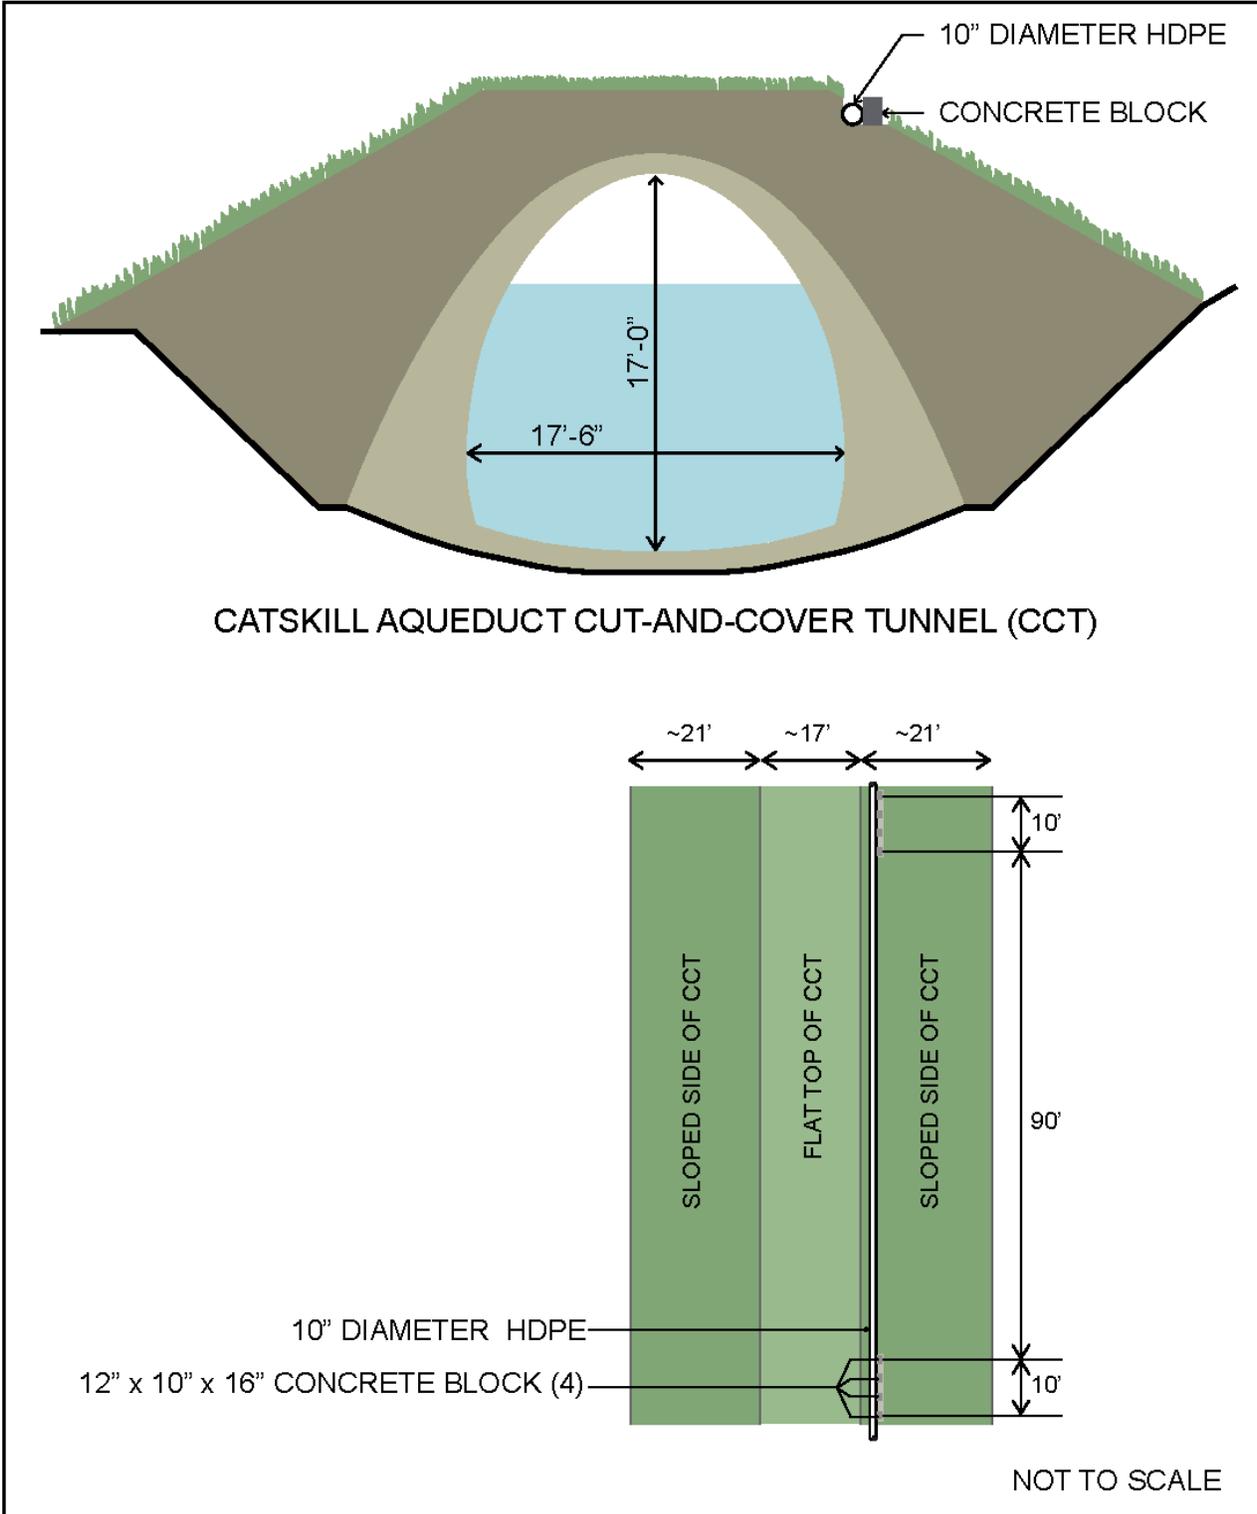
Proposed Pipeline Cross-Section and Plan View
